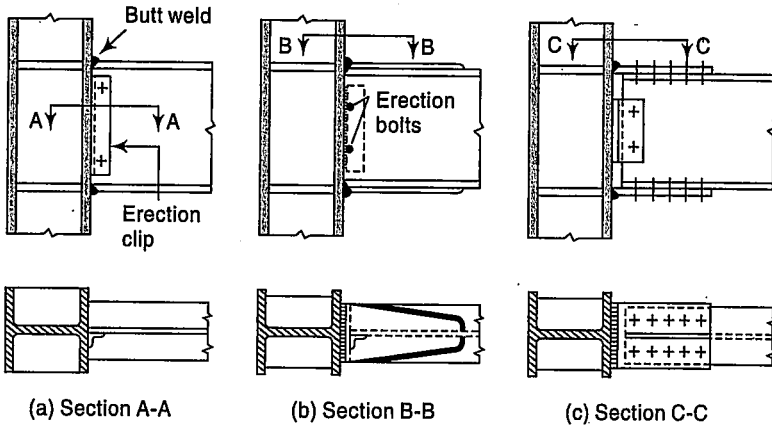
Details of connections (Krawinkler et al. 1982)
